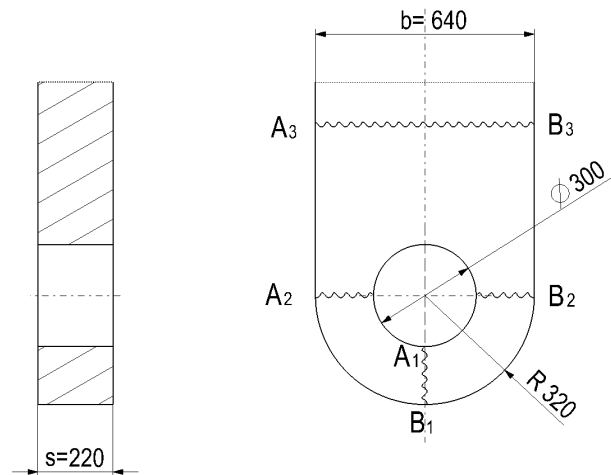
Detail around the opening at the brace with marked characteristic cross-sections
